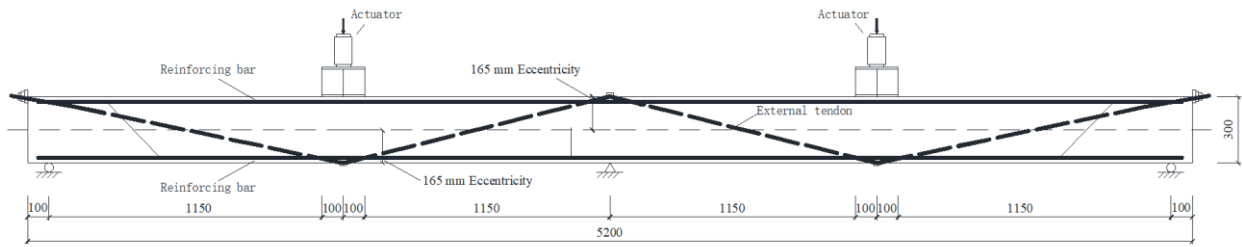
External prestress tendon profile of specimens (dimensions in mm)
